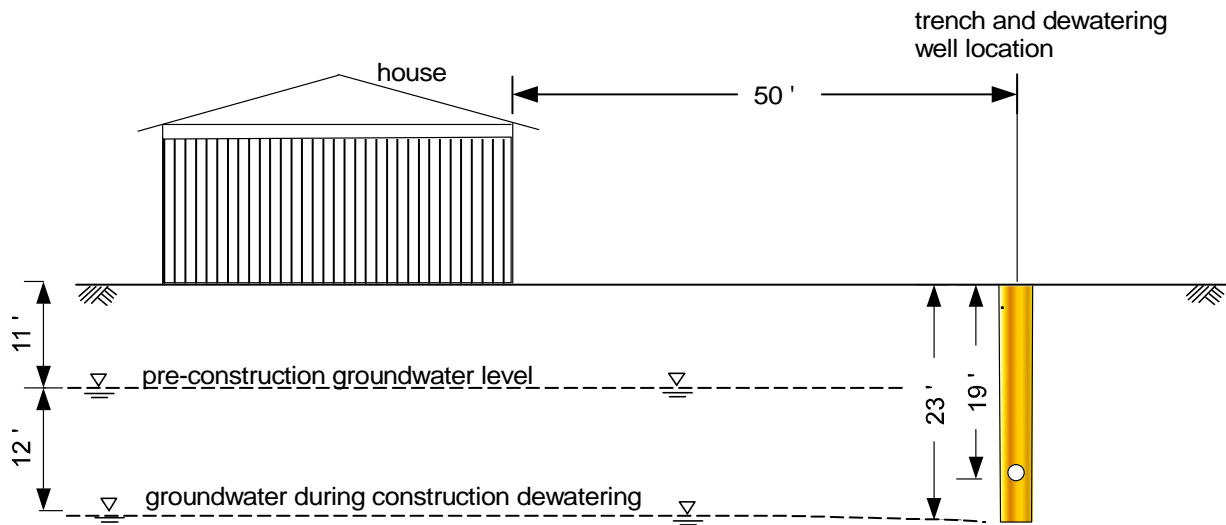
Subsurface cross-section at the site (Note: dimensions shown are to the nearest foot).
